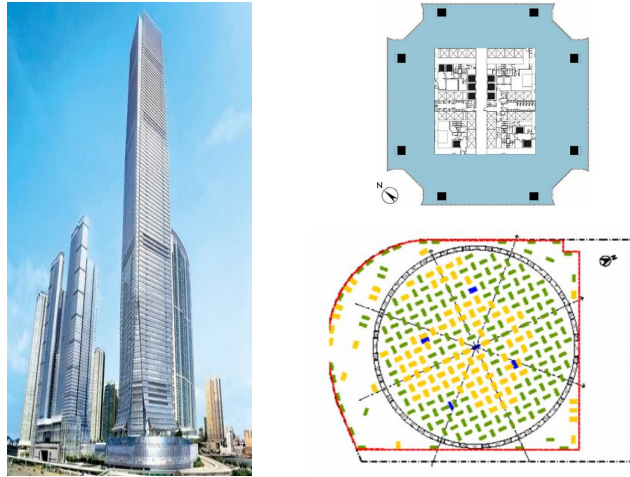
Layout of upper structure and foundation structure of ICC Tower, Hong Kong [11]
